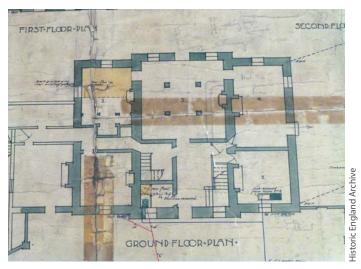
LCC ground floor plans for Marble Hill House, 1905
